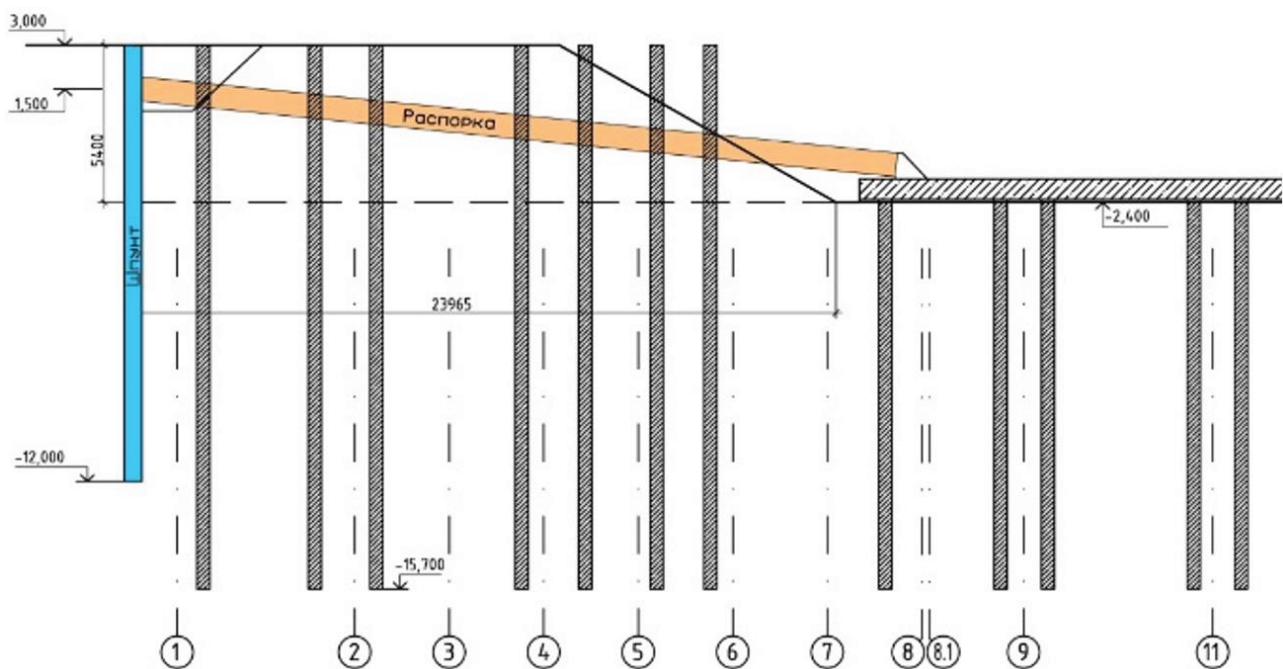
General scheme of the structural elements of the pit, spacer system, pile foundation.
